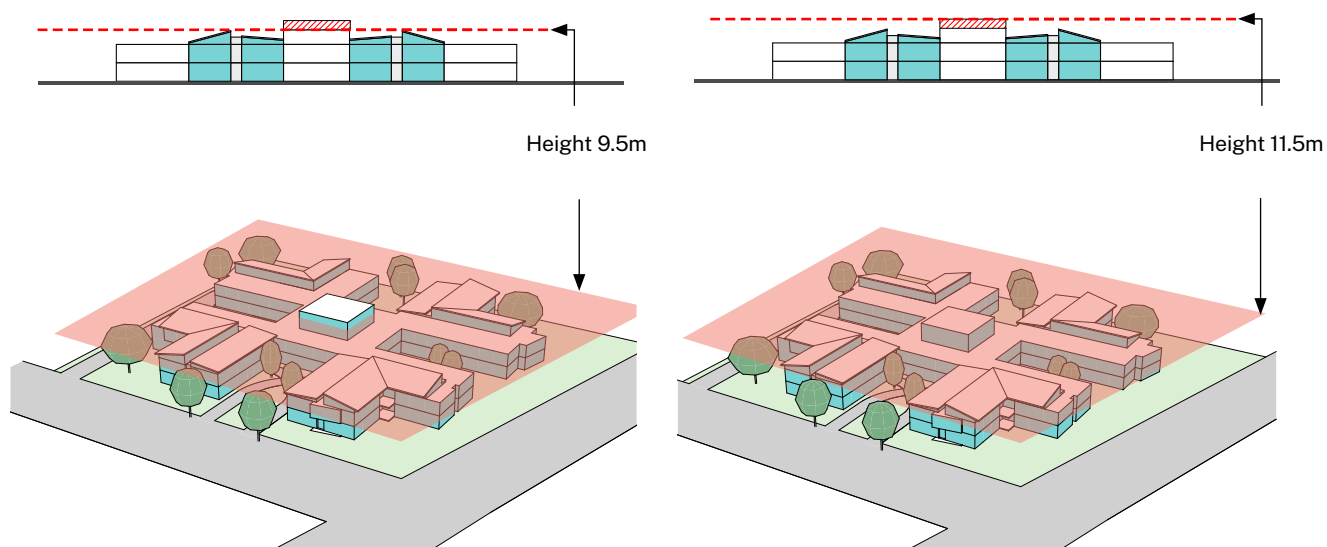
A Development standard for a maximum permissible building height in zones where residential flat buildings are not permitted is 9.5m. Maximum permissible building height for roof service equipment is 11.5m for 20% of surface area of roof as defined in the SEPP (Housing) 2021
